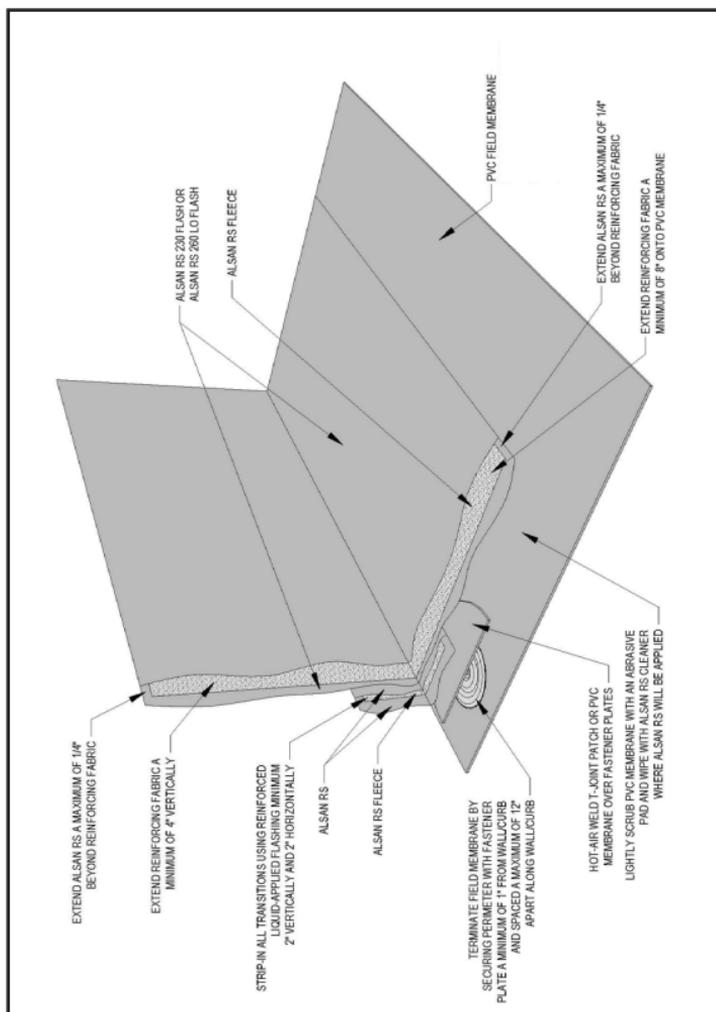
ALSAN RS Wall/Curb Flashing On PVC Membrane With Horizontal Perimeter Fastening
